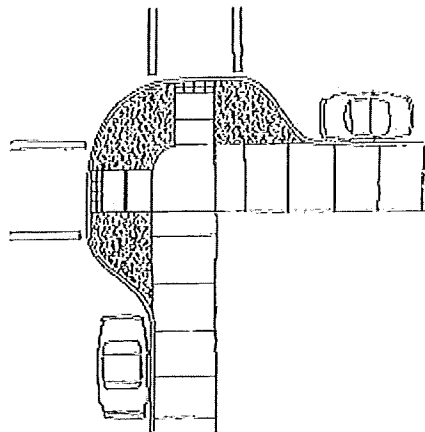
Curb extensions extend corners into parking lanes and provide space for curb ramps.
